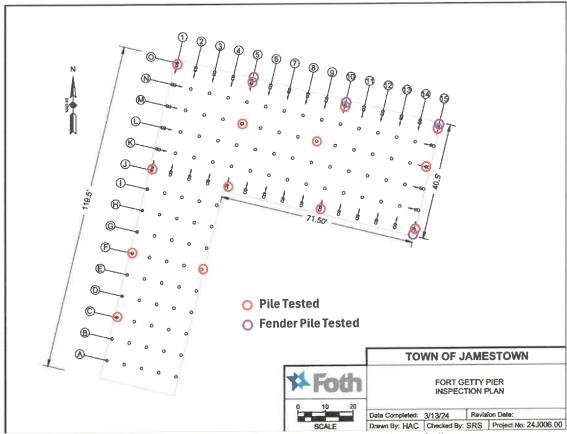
Inspection Plan for Fort Getty Pier with locations of piles test.
